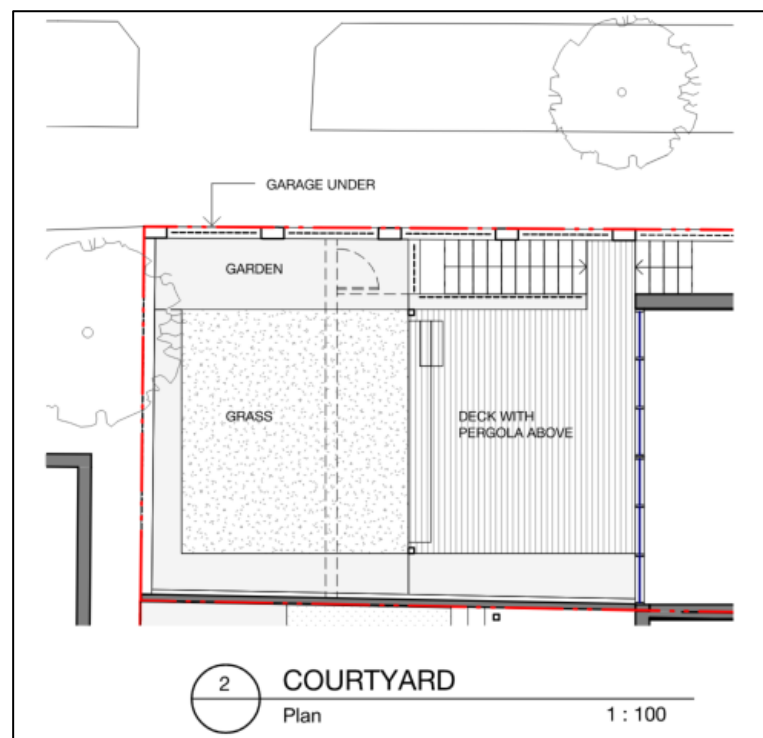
Approved courtyard/terrace plan – 2 Barrett Place, Randwick
